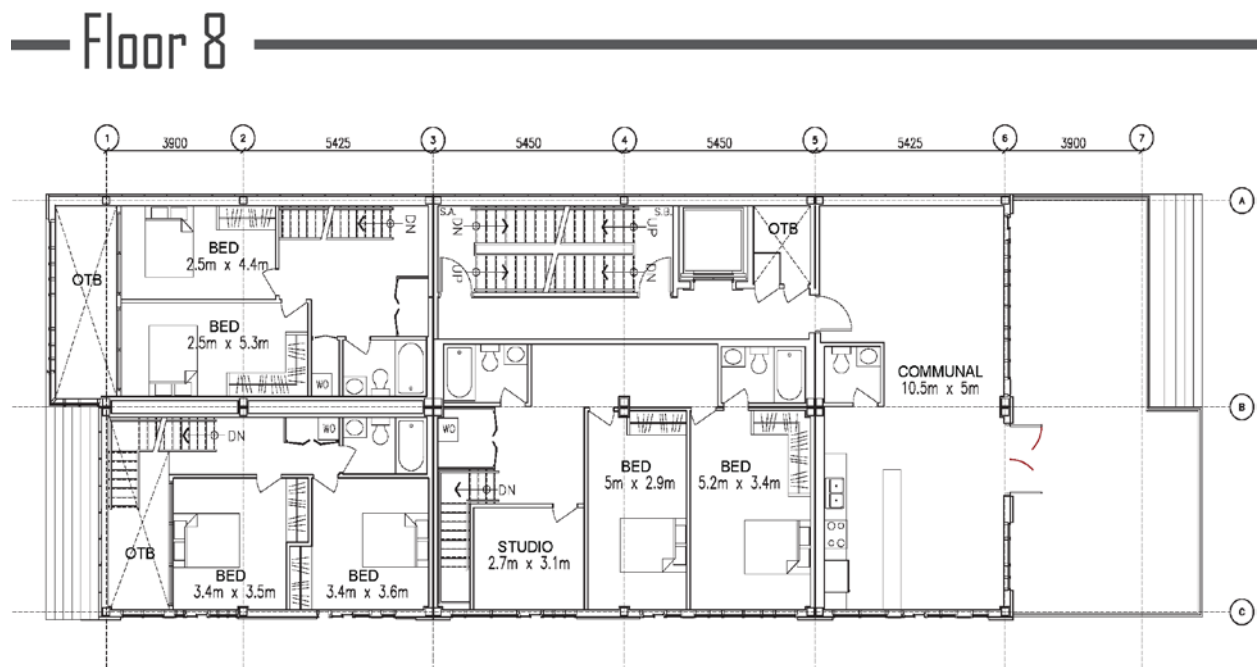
The Eighth Floor Plan, residential and common space
